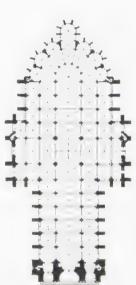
B.—AMIENS. CATHEDRAL. PLAN.
